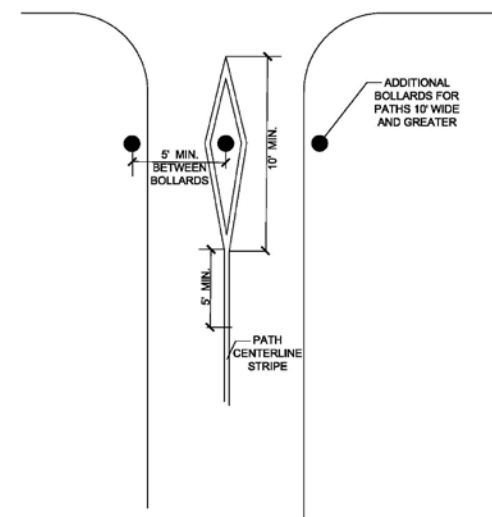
Bollard layout at trail and pedestrian bridge entry points
